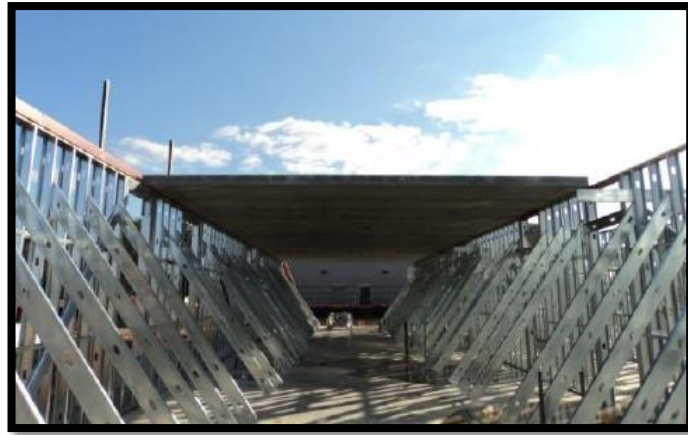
Precast Hollow-core Floor Planks - Courtesy of Barton Malow
